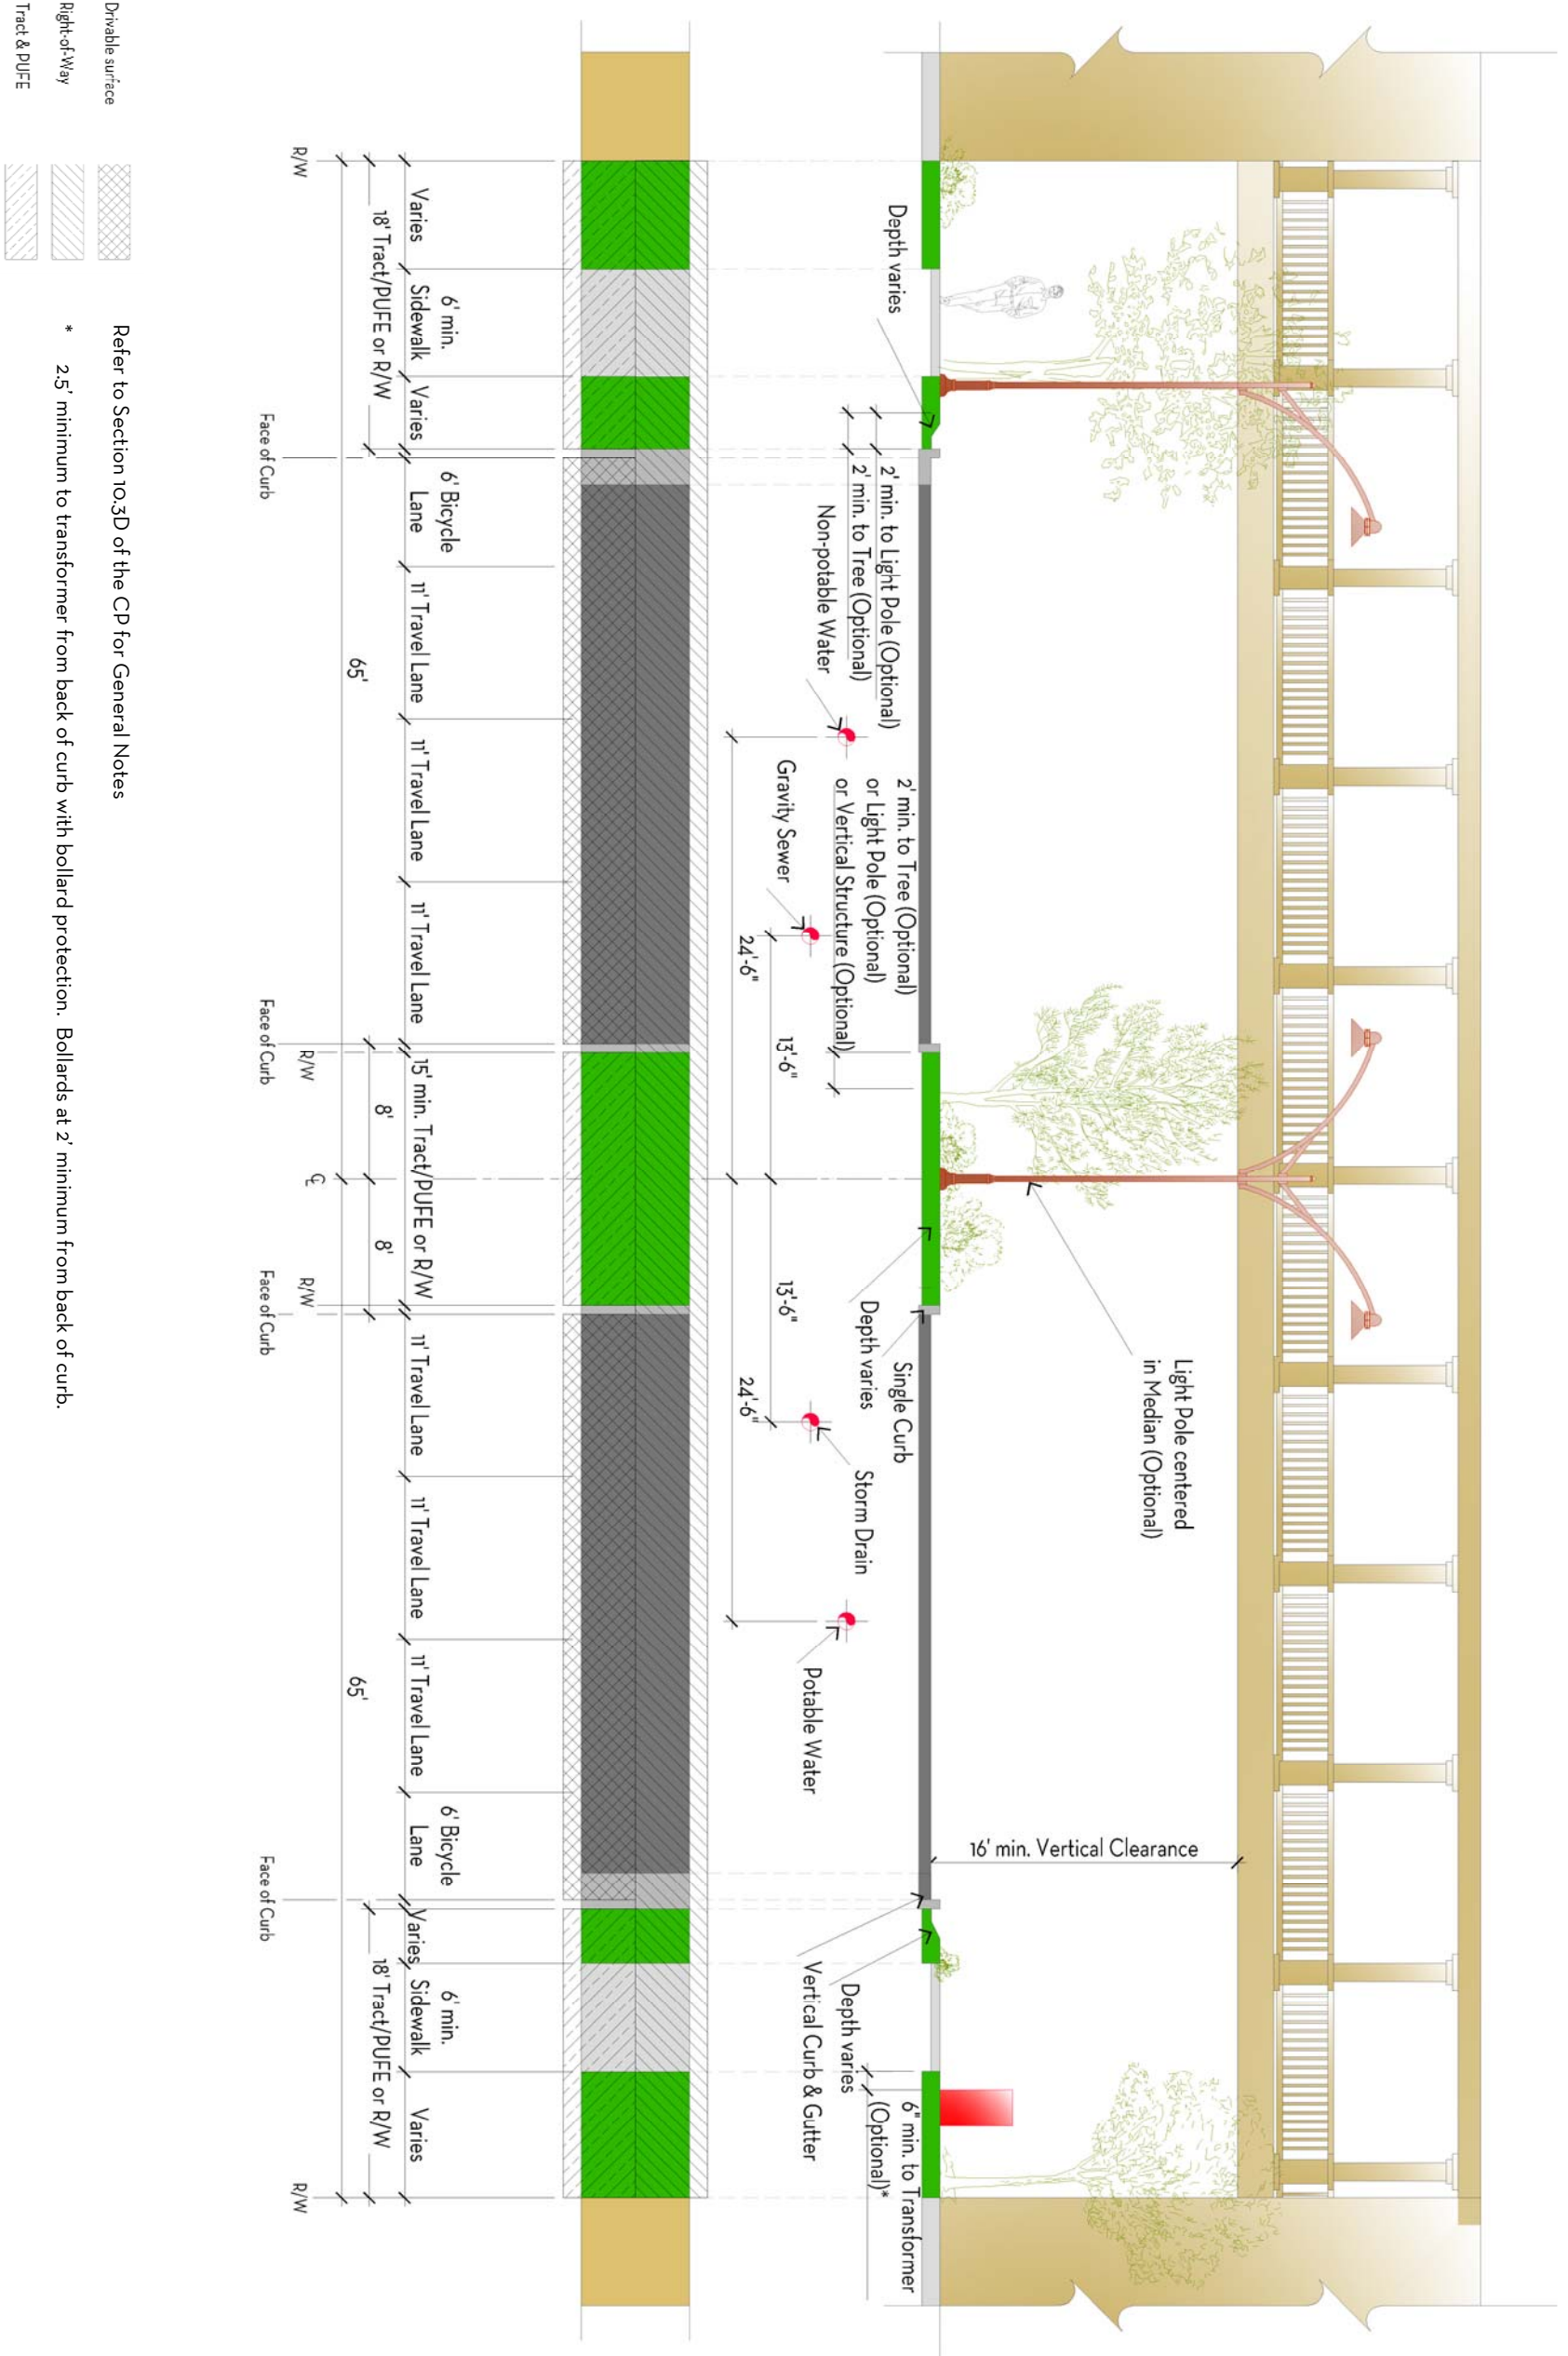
6 Lane Perimeter Arterial/6 Lane Internal Arterial (Ray Road) - Detailed Cross Section
